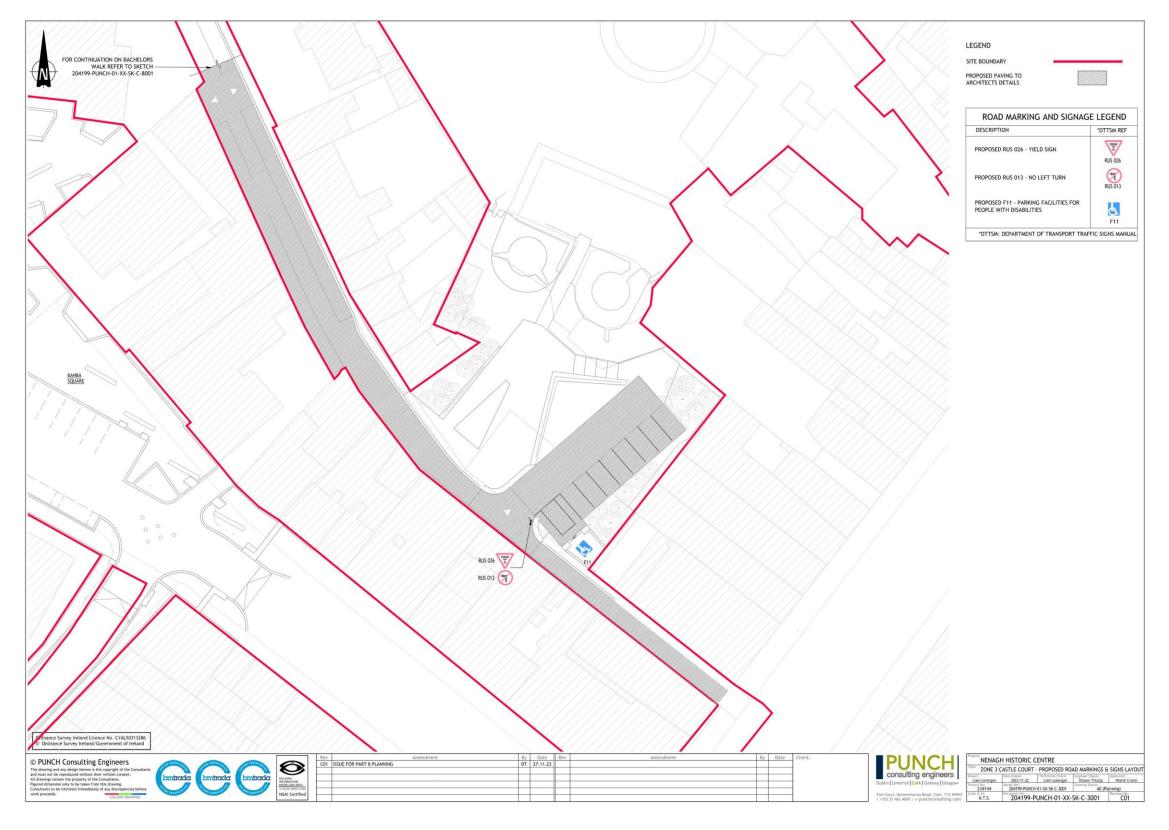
Proposed Road Design Castle Forecourt (NHCQ Zone 3)
